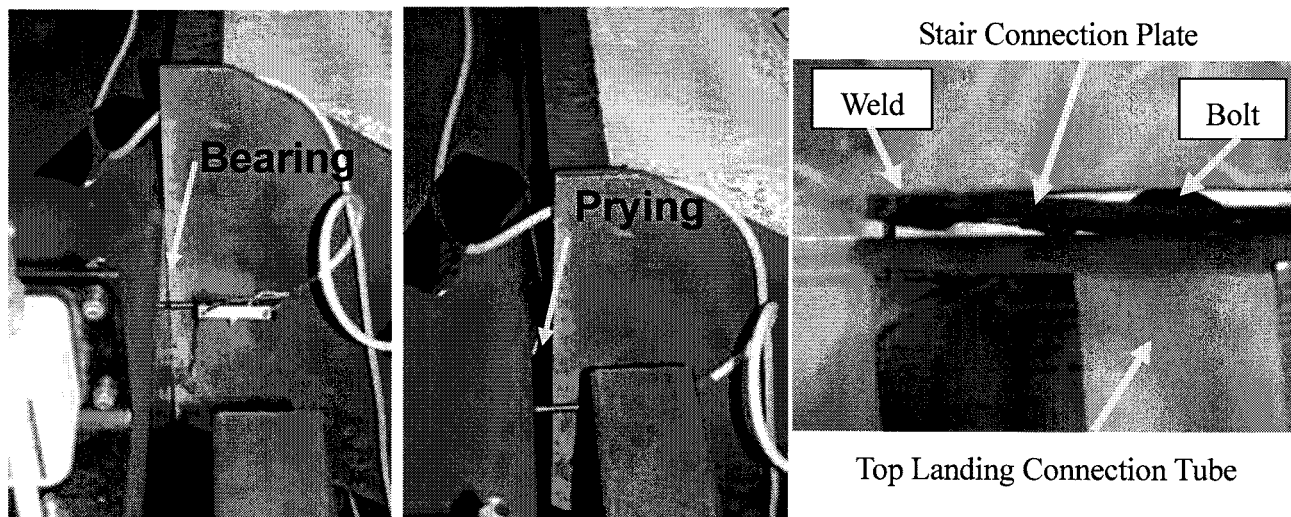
Alternating top landing connection bearing and prying during transverse loading
